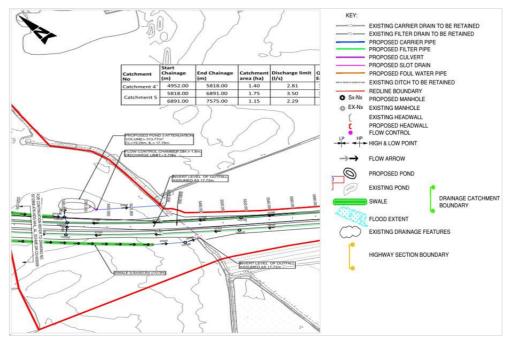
Proposed Pond 3 – layout and discharge location
